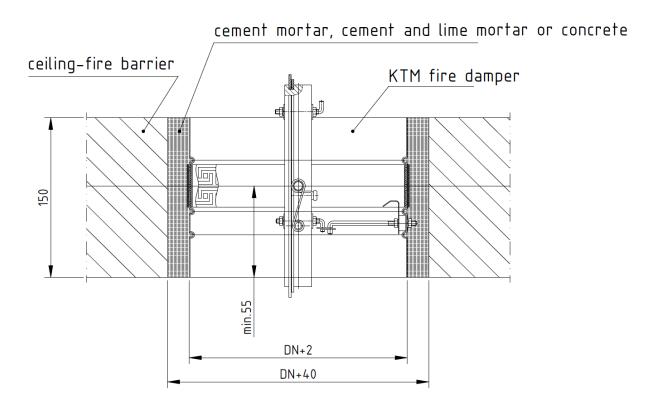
Installation of KTM fire damper (female coupling) in rigid ceiling barrier
